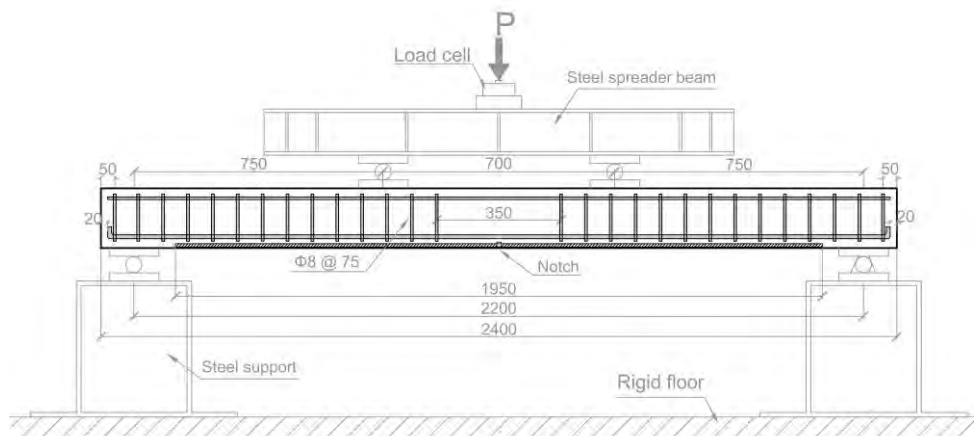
Tests setup for instantaneous loading (dimensions in mm).
